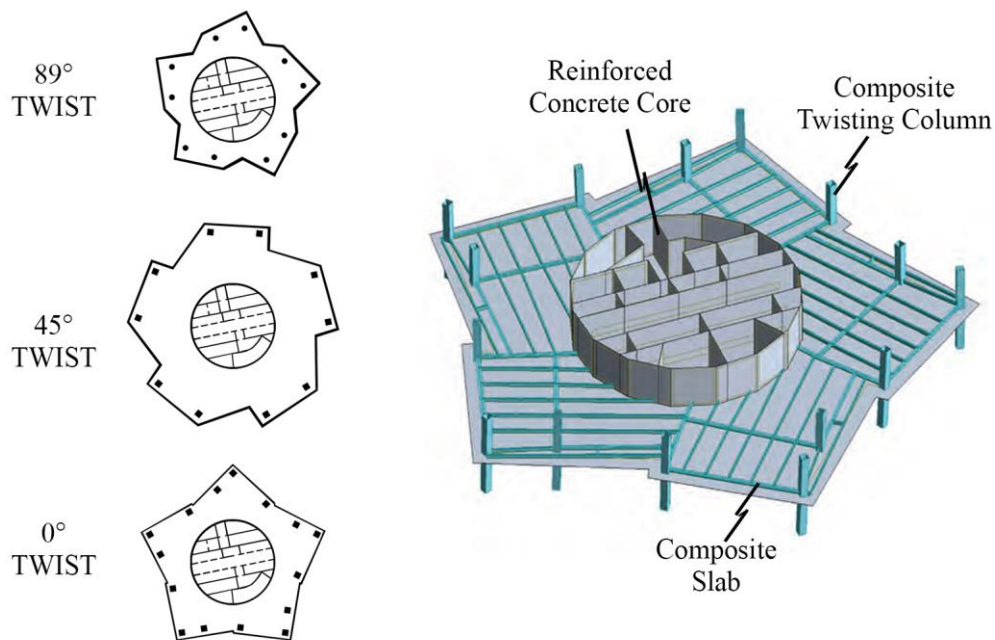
Lakhta Center; floor plans of 0° - 45° - 89° rotation (left) (RMJM, 2019a) and components of the structural system (right) (AskariNejad, 2014)
